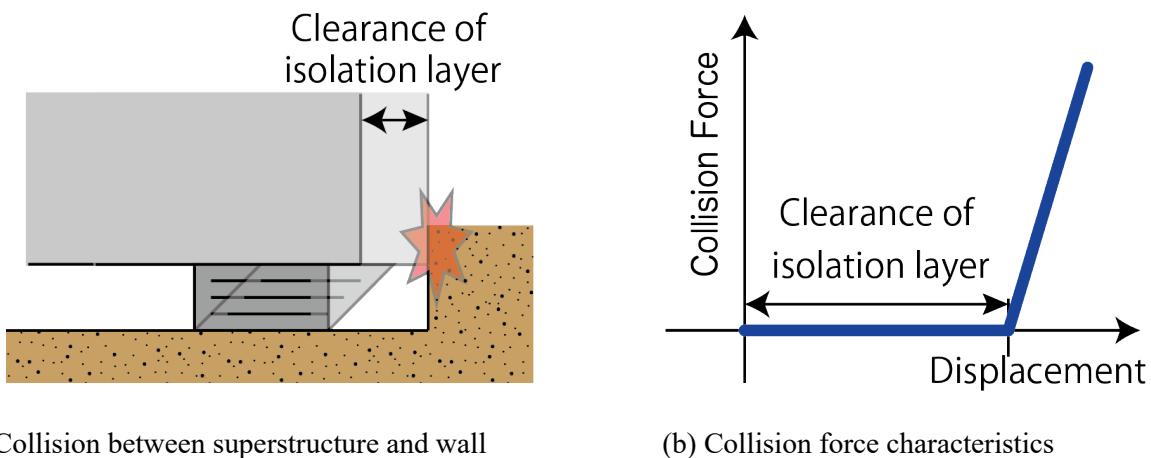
Collision force characteristics between superstructure and surrounding wall.
